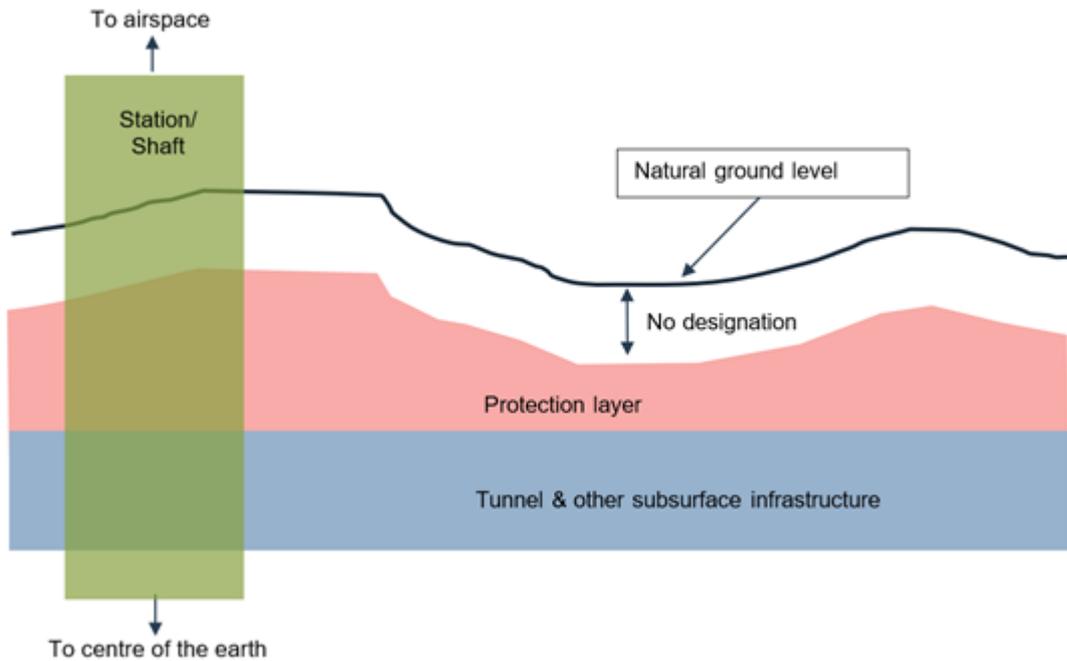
Long section view showing tunnel, protection and vent shafts and/or station designations
